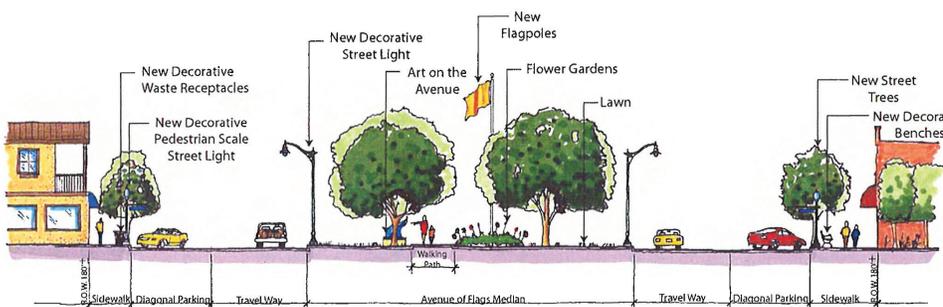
The proposed Streetscape in 2002. (Source: City of Buellton Avenue of Flags/ Highway 246 Urban Design Plan)
